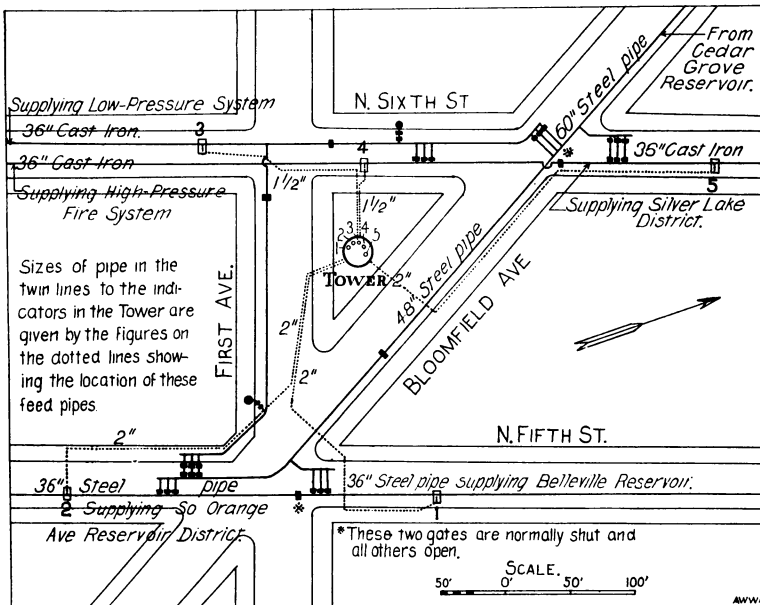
PIPE CONNECTIONS AT THE TOWER
